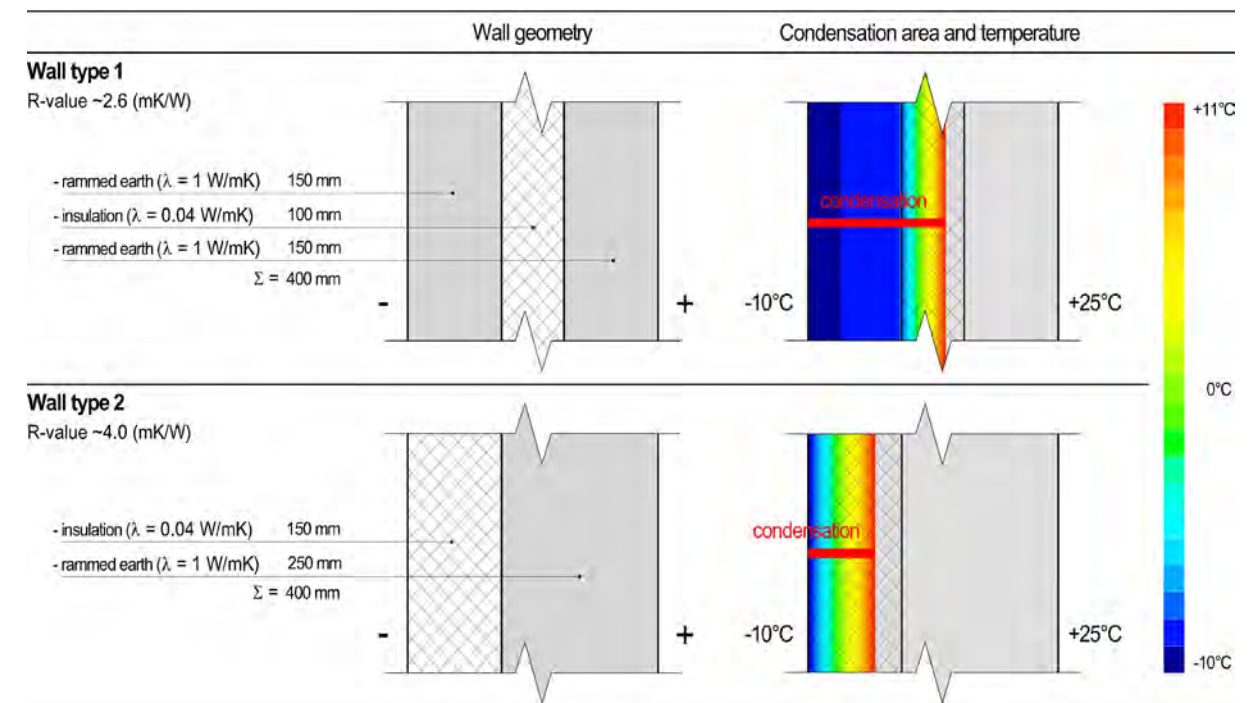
Dew point calculations for 2 common insulated rammed earth wall types
